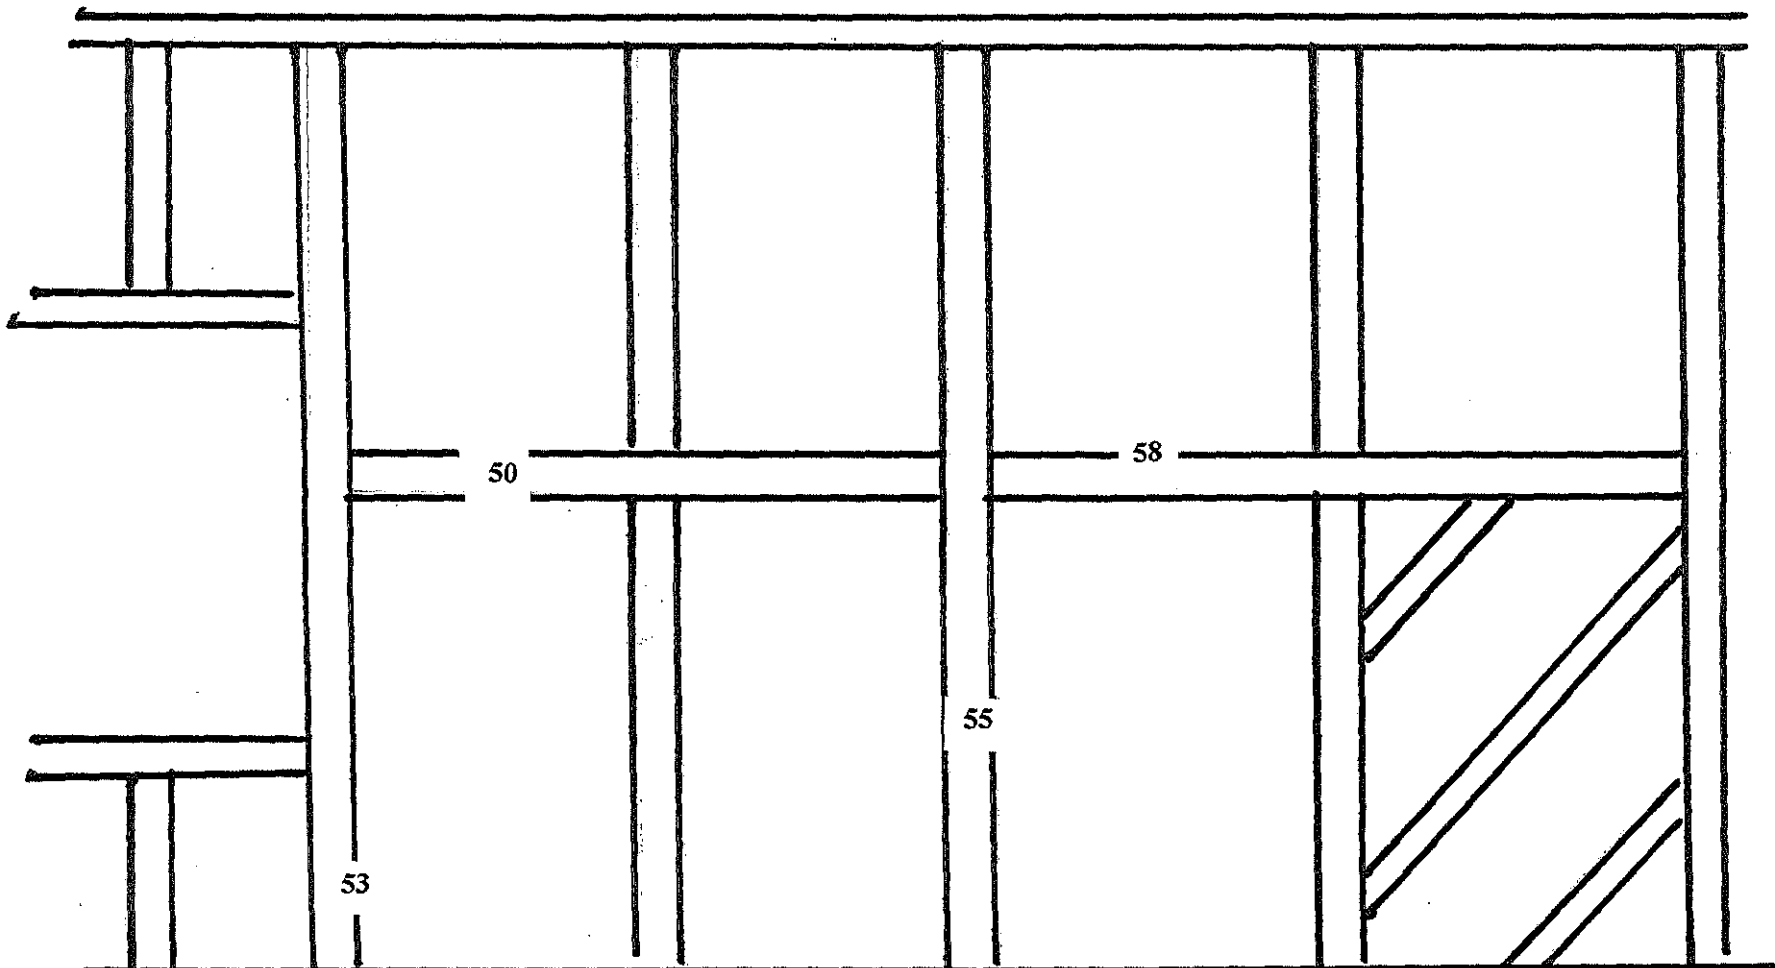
Sketch drawing of the north wall of bedroom A to show position of timbers sampled (viewed from the south looking north)
